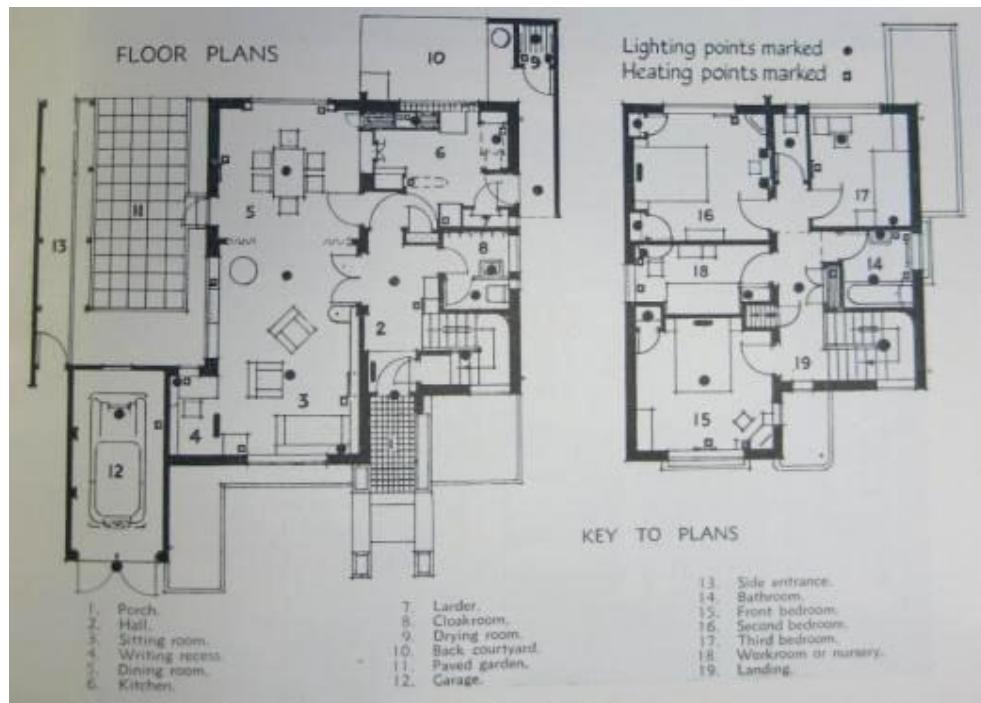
Floor plans for the EAW All-Electric House, Bristol 1936.⁶⁰⁰
